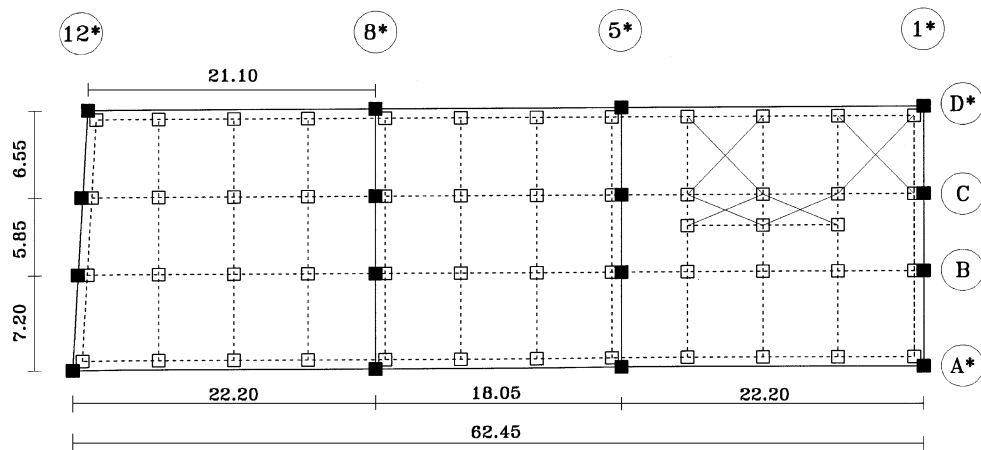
Plan view of the existing MBF retrofit (dimensions in meters)
